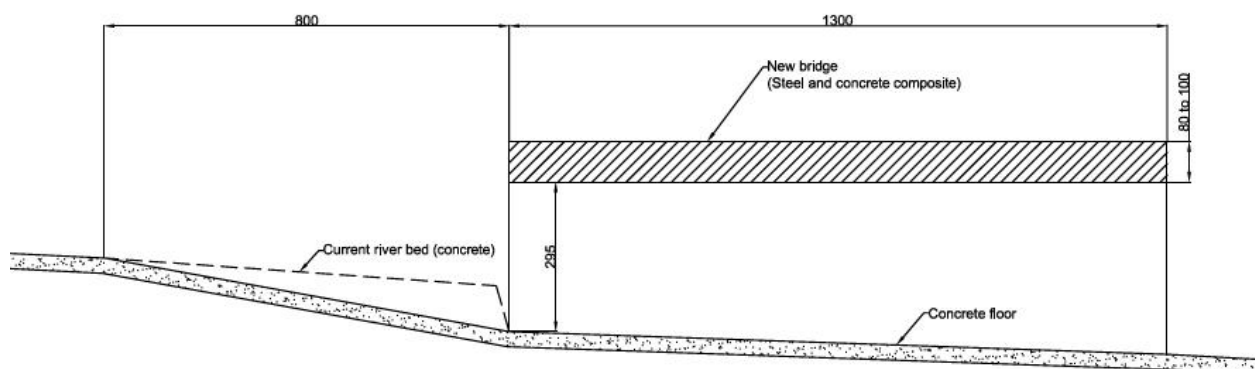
Longitudinal profile of the Muhe river proposed new bridge (lengths in cm)
